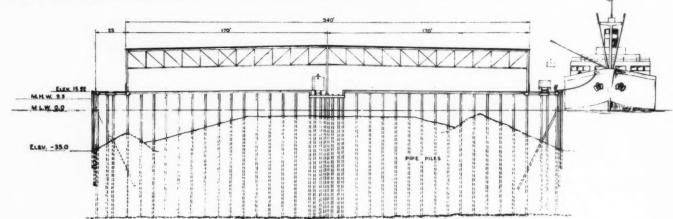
Typical cross-section of proposed East Boston Pier No. 1.
